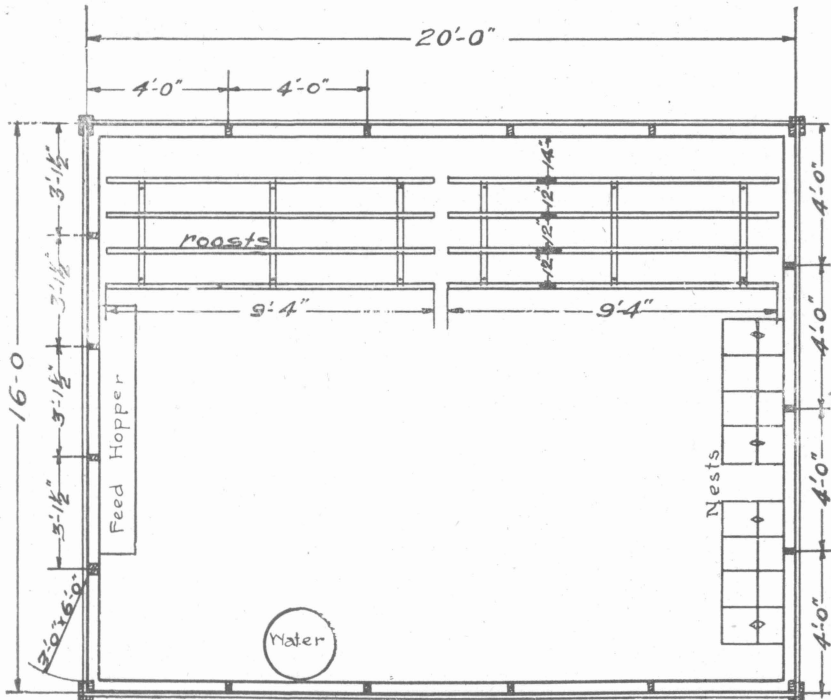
Floor plan of shed roof open front house for 100 hens.
